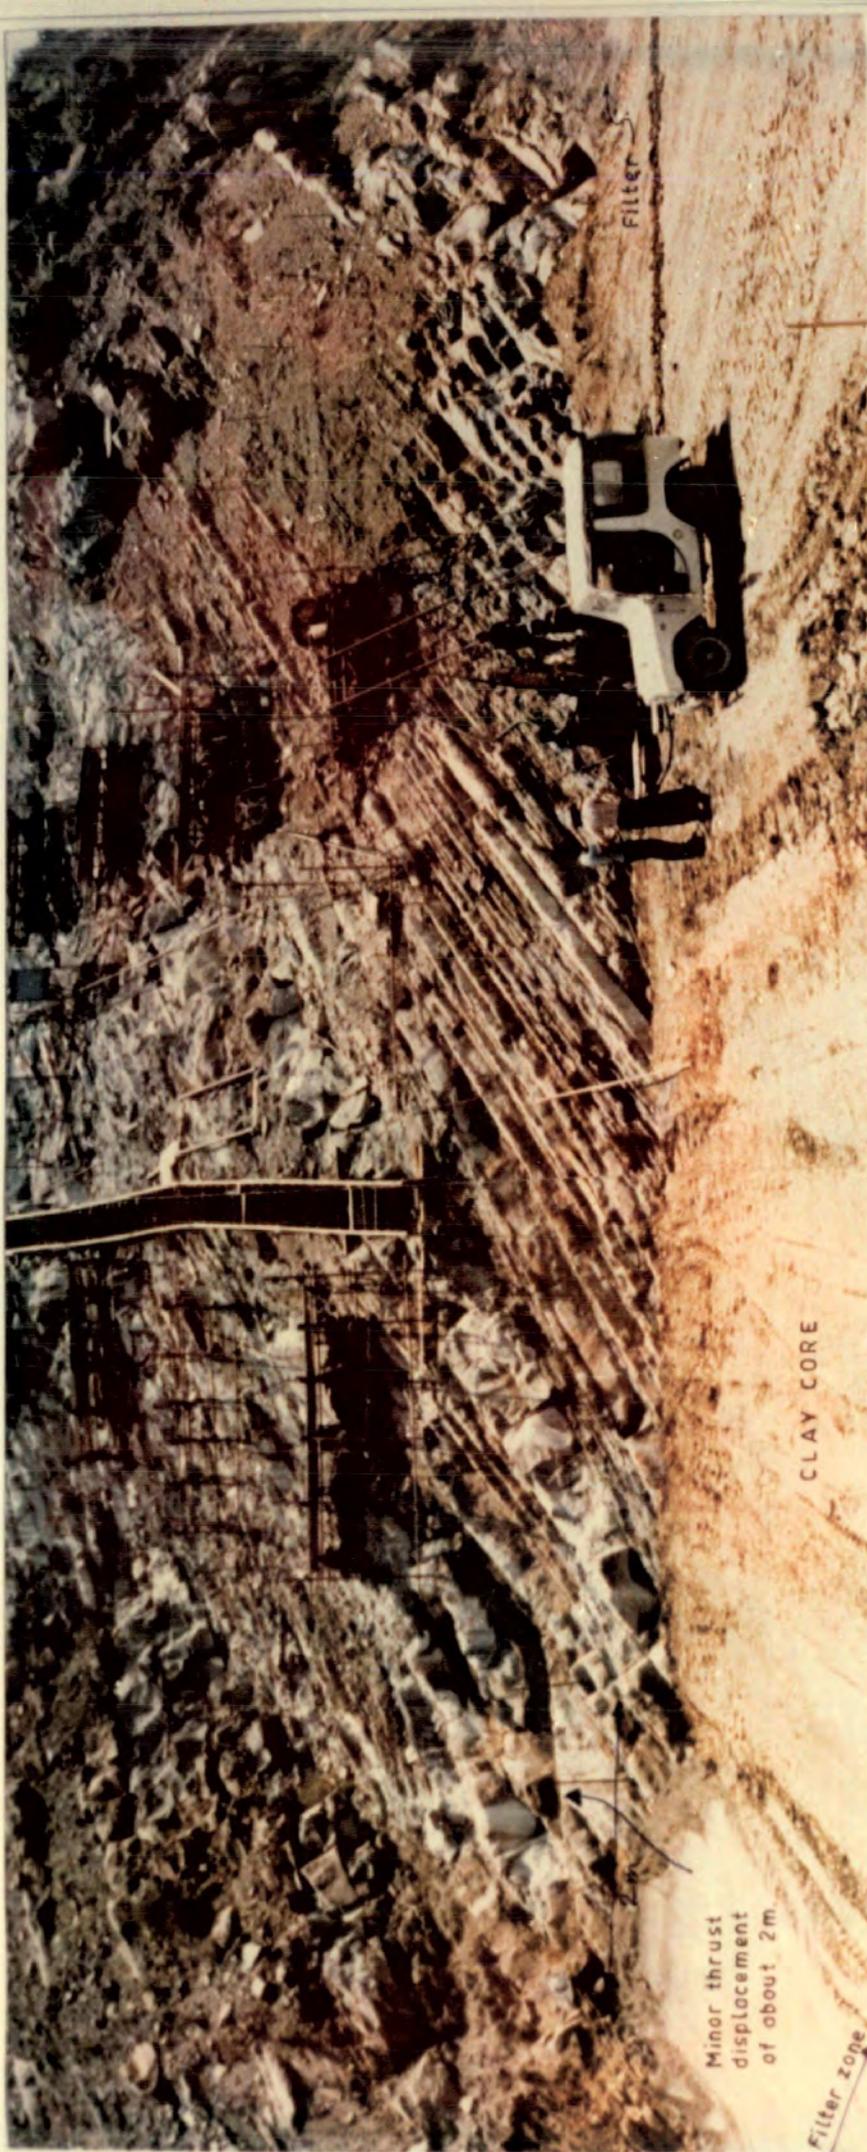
Core placement on to the left abutment sandstone (SST) sequence (Pournari dam)
